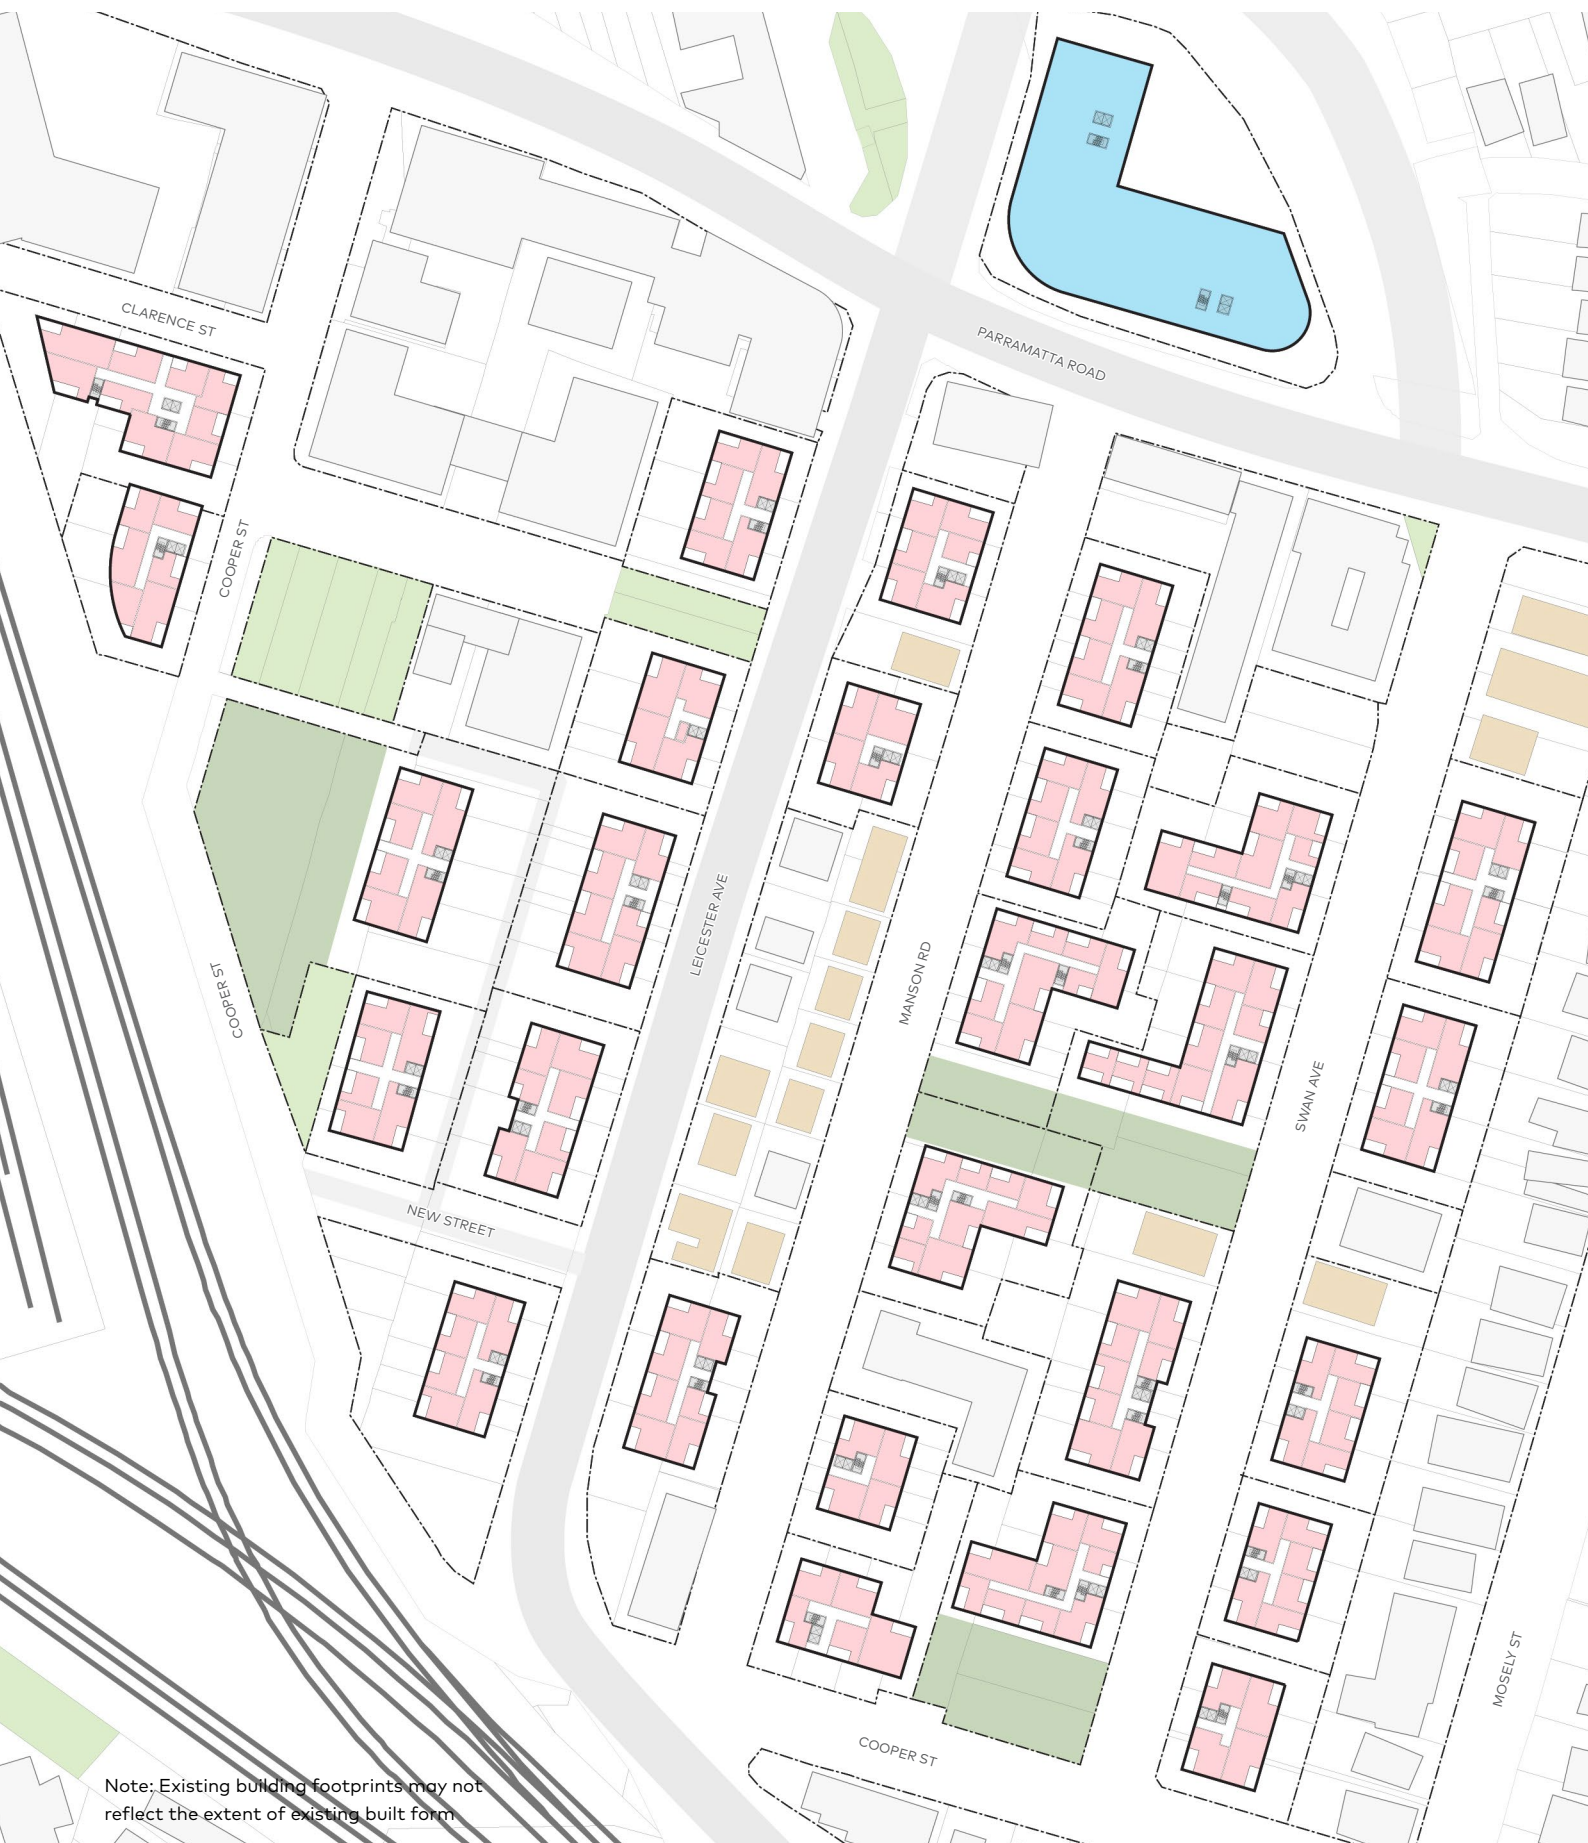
Typical lower level floors - Indicative layout - Strathfield Triangle
